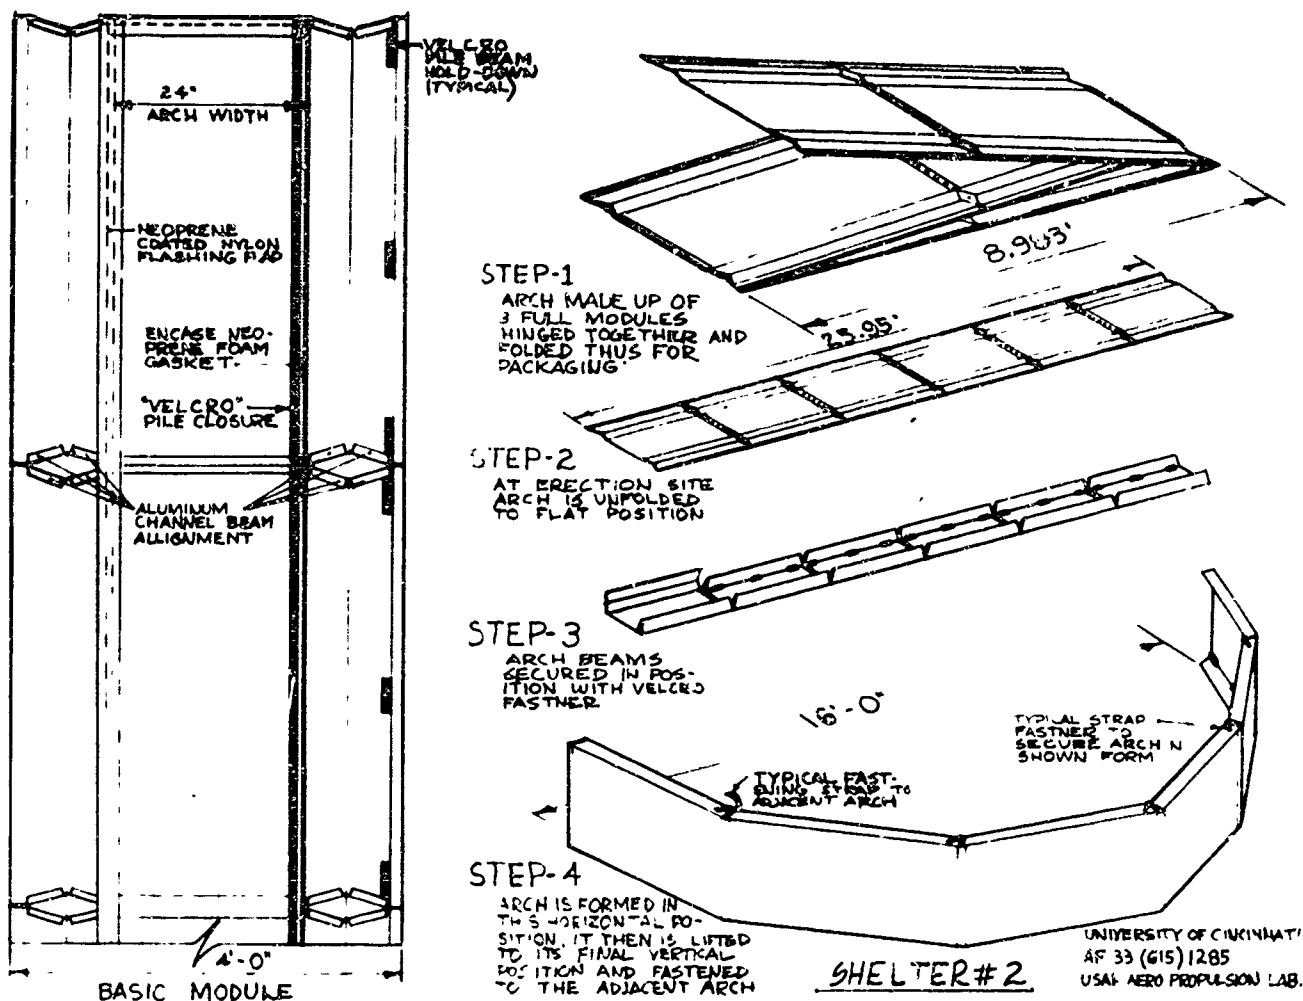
Drawing - Basic module and typical arch "folded beam" concept.
